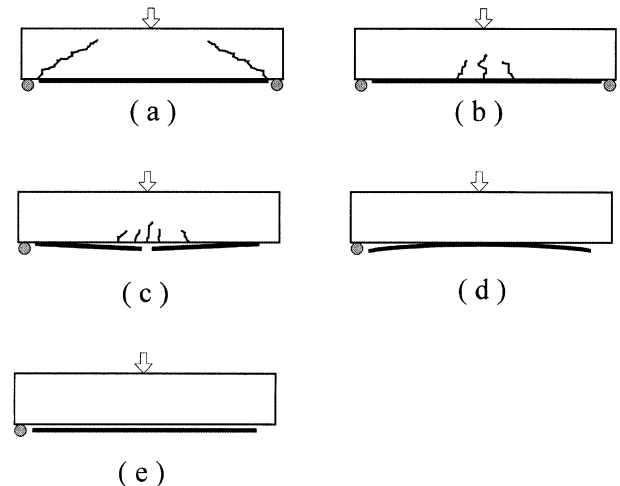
Typical failure patterns of plate-bonded concrete structures.
